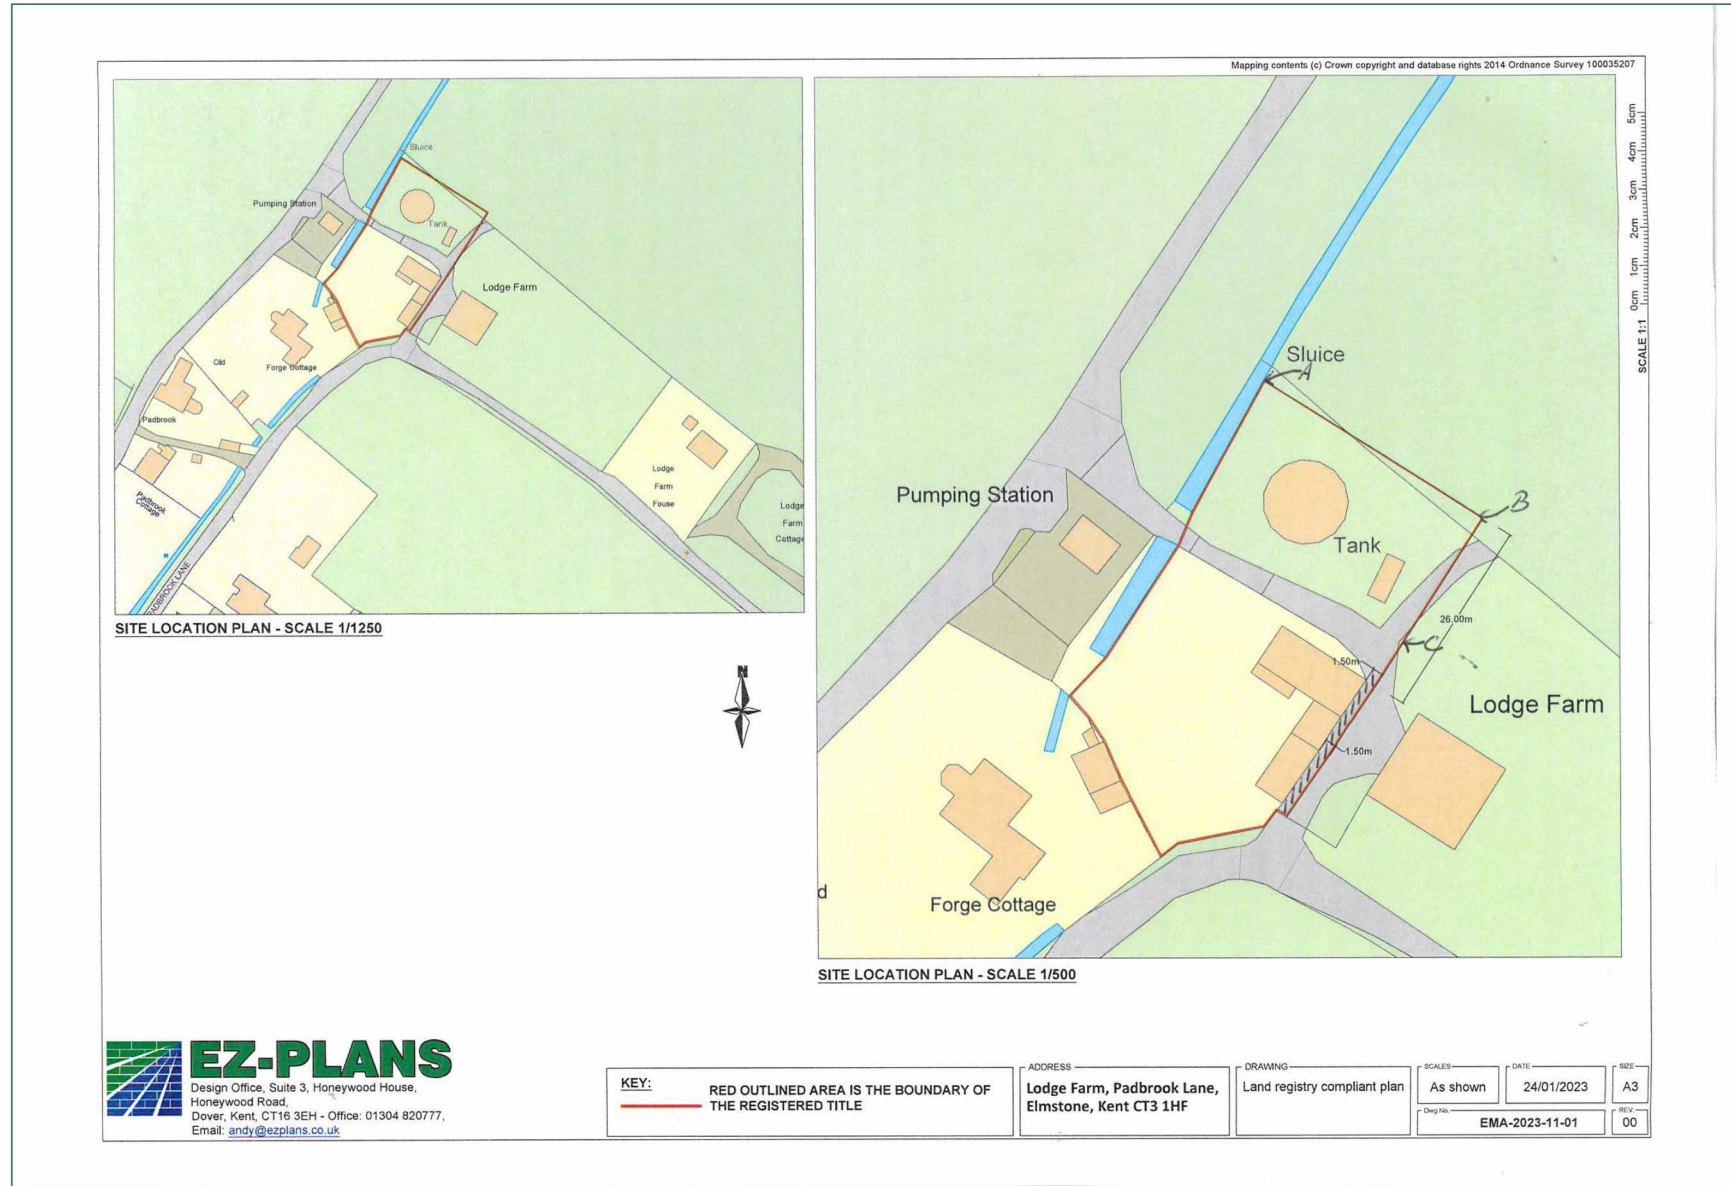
Existing site plan (EZ-Plans, Drawing No. EMA-2023-11-01, dated 24/01/2023).
